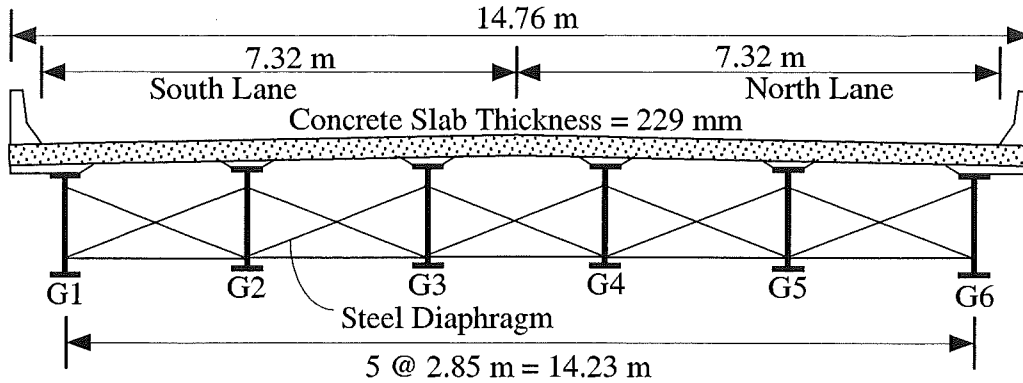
Cross-Section of the Bridge M36/HR (B01-47041).
